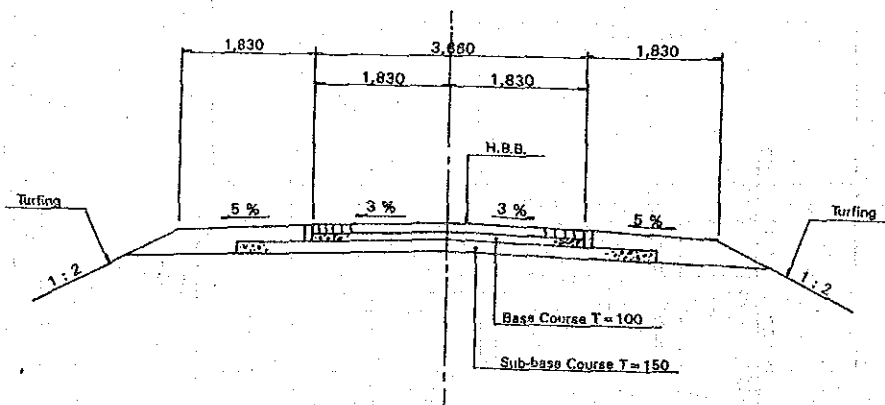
TYPICAL CROSS SECTION OF APPROACH ROADS
